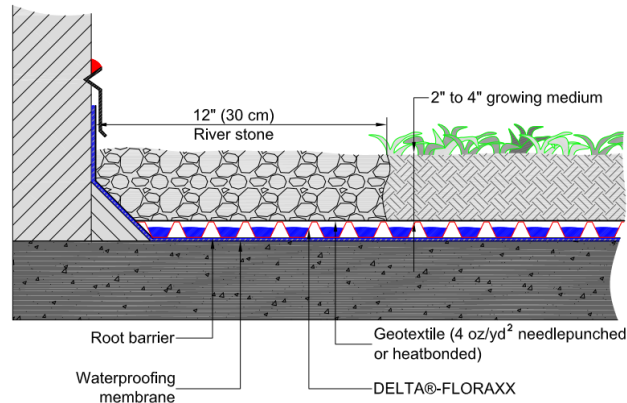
Green roof system. Delta garden roof system with floorax. Membranas y soluciones. Mexico.
